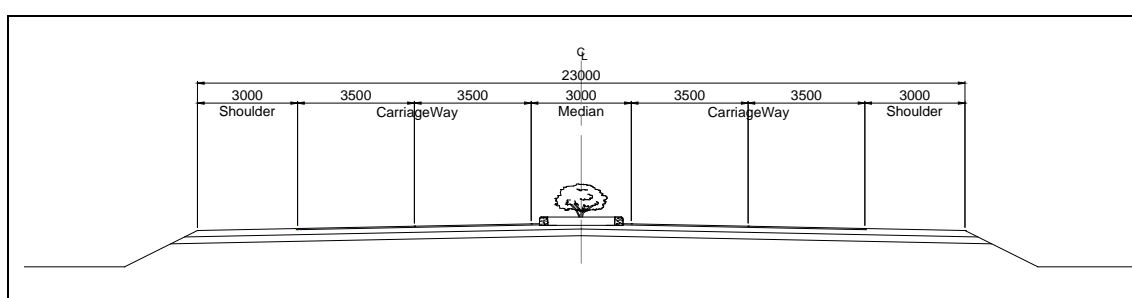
Proposed Typical Cross Section of Odongk Bypass
